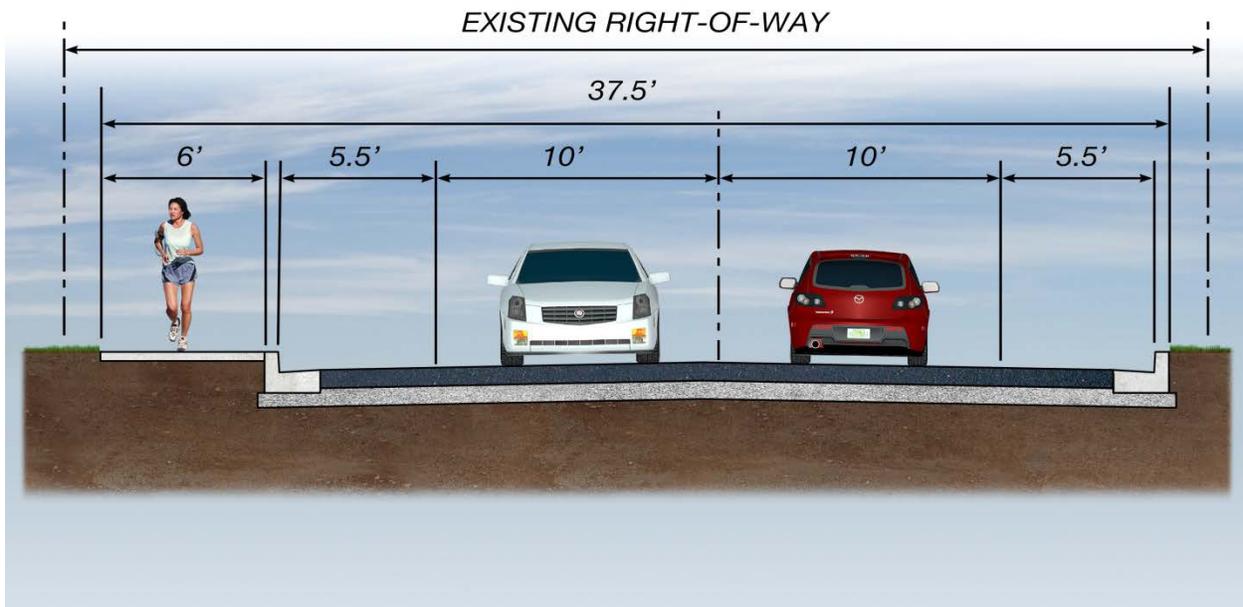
Proposed Roadway Section West of Proposed Movable Bridge
